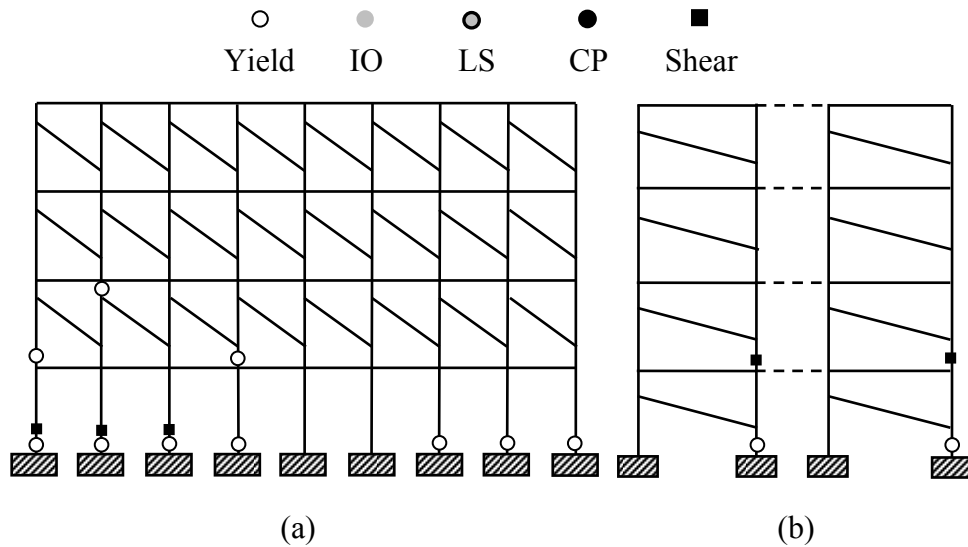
Collapse mechanism of four storey RC infilled frame building with open front bay in ground storey, designed for gravity loads alone as per relevant Indian Standards: (a) open front bay in longitudinal direction; (b) typical transverse frame.
